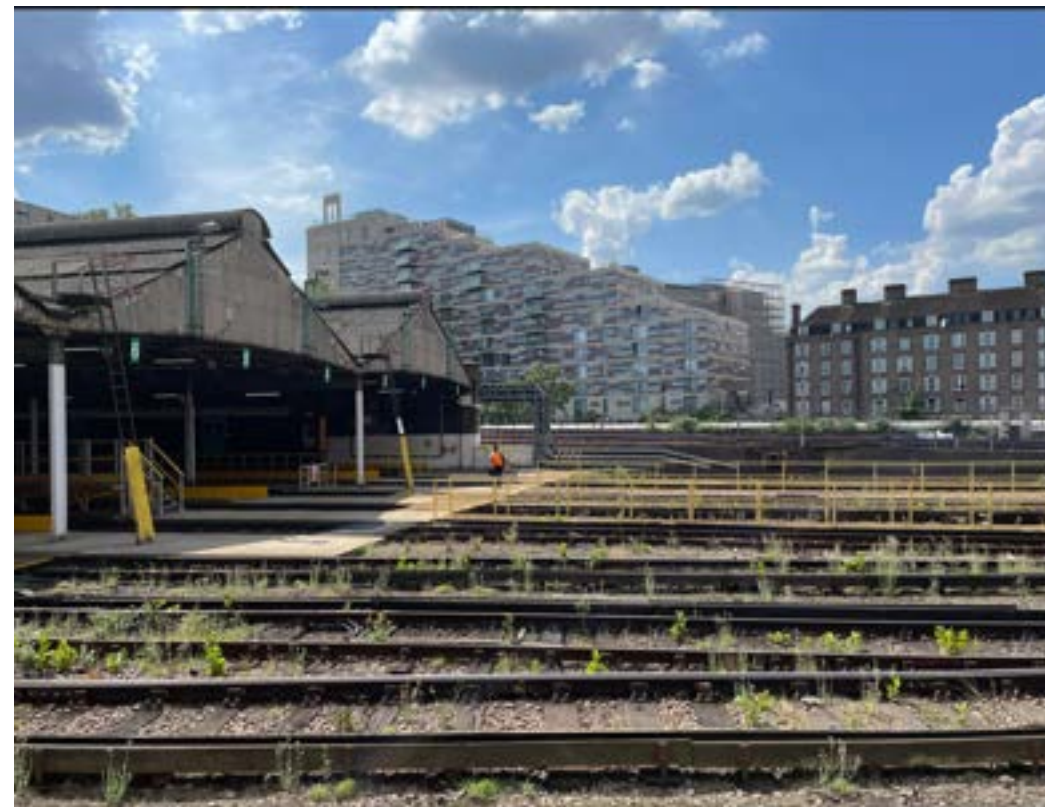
Site. Photograph taken on Site Visit 16/08/2023
